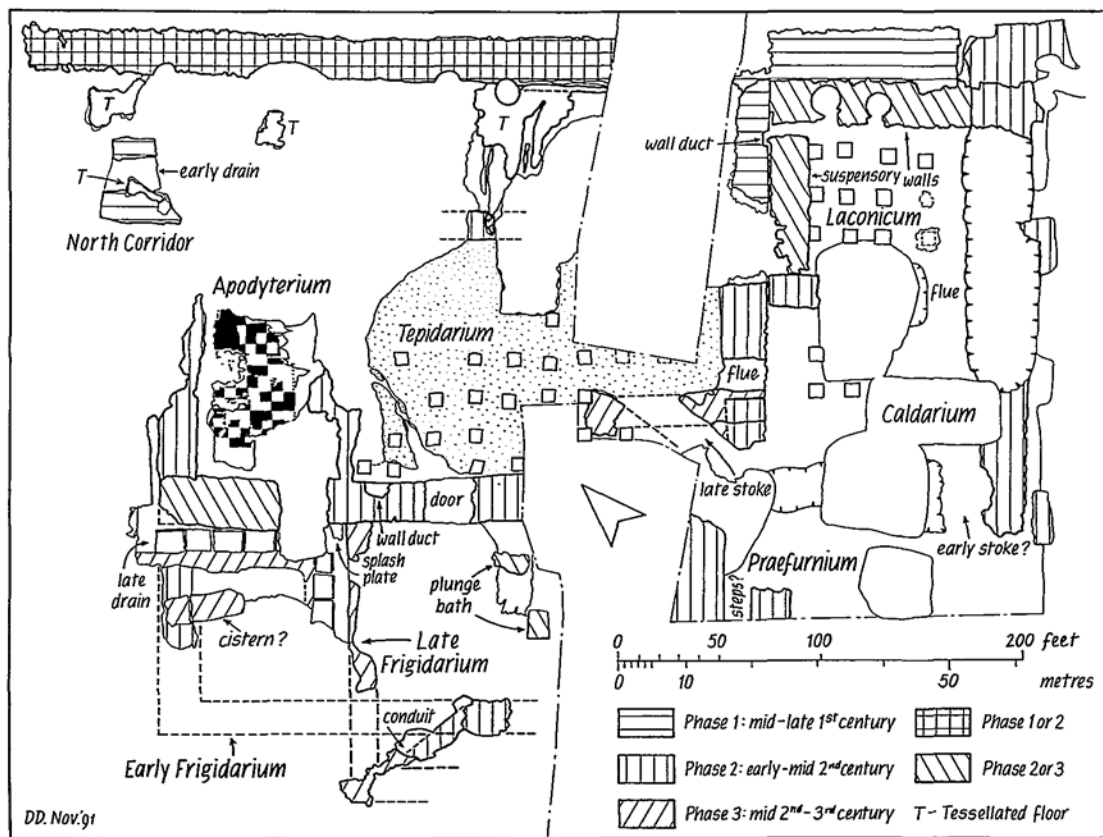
Longmarket, Canterbury: Plan of the bath-house after removal of the tessellated floor of the *tepidarium* heating system.
